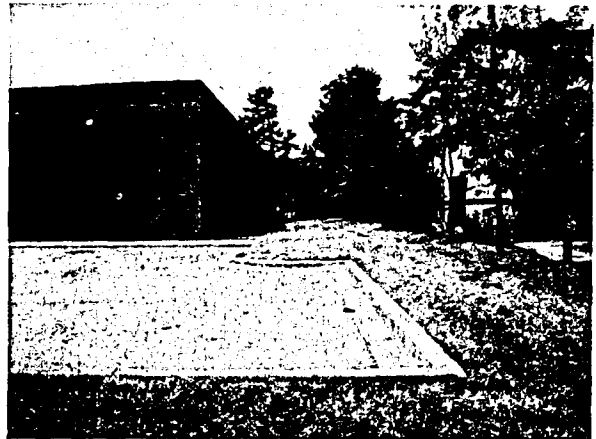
Photograph of the back side of the on-site building, facing west from northeast site boundary. Note north adjacent Citgo gas station.
